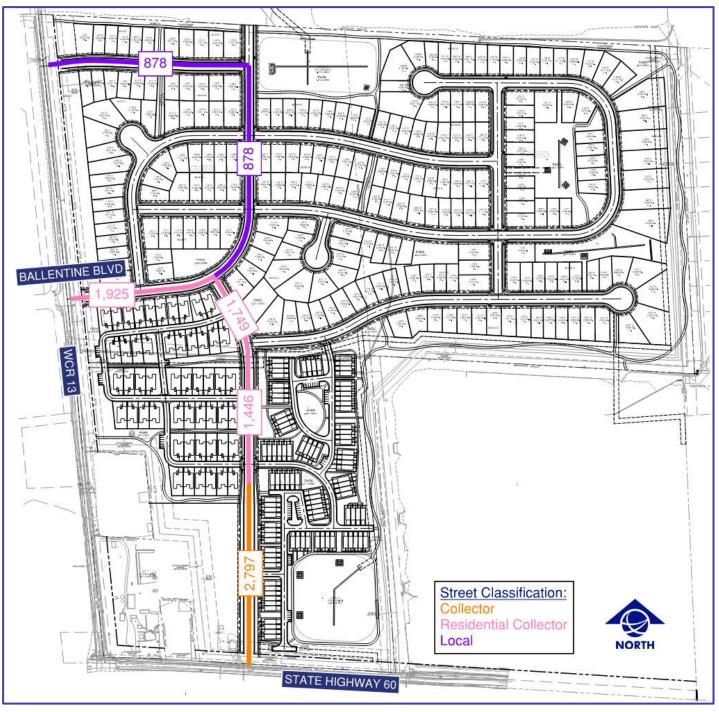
Internal Roadway Volumes for Full Buildout (2028)
